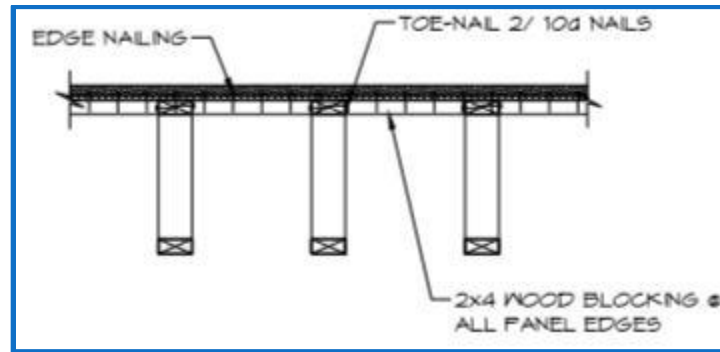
Floor Diaphragm for Shear Transfer (KSS)
